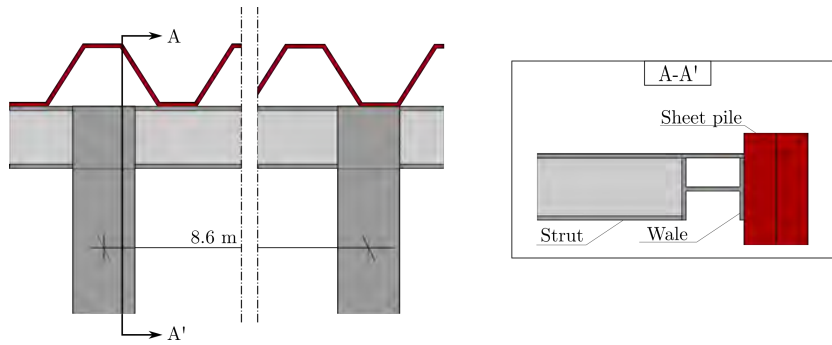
Top View of the Arrangement of the Struts and Wales
